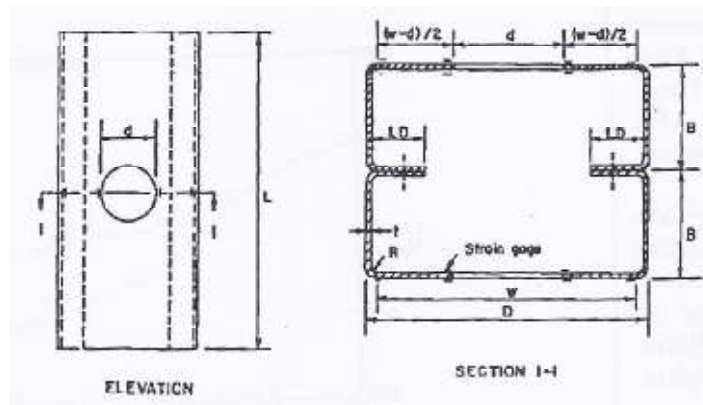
Typical I-section specimens tested by Yu and Davis (1973)
